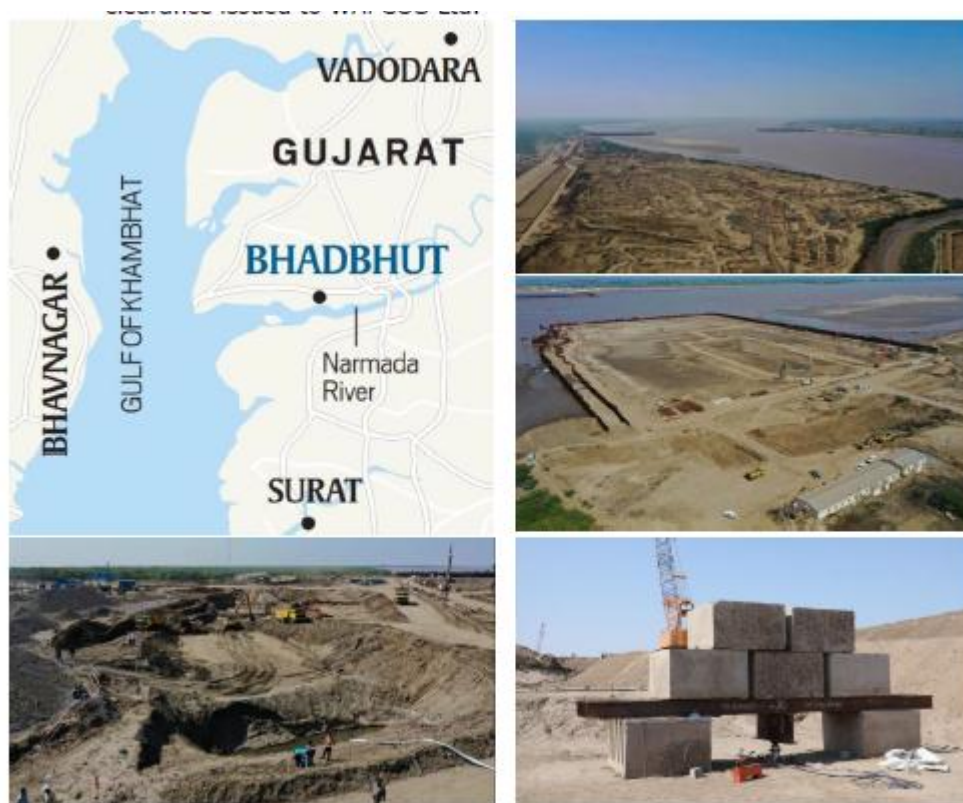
Bhadbhut Barrage Project Location and Construction overview
